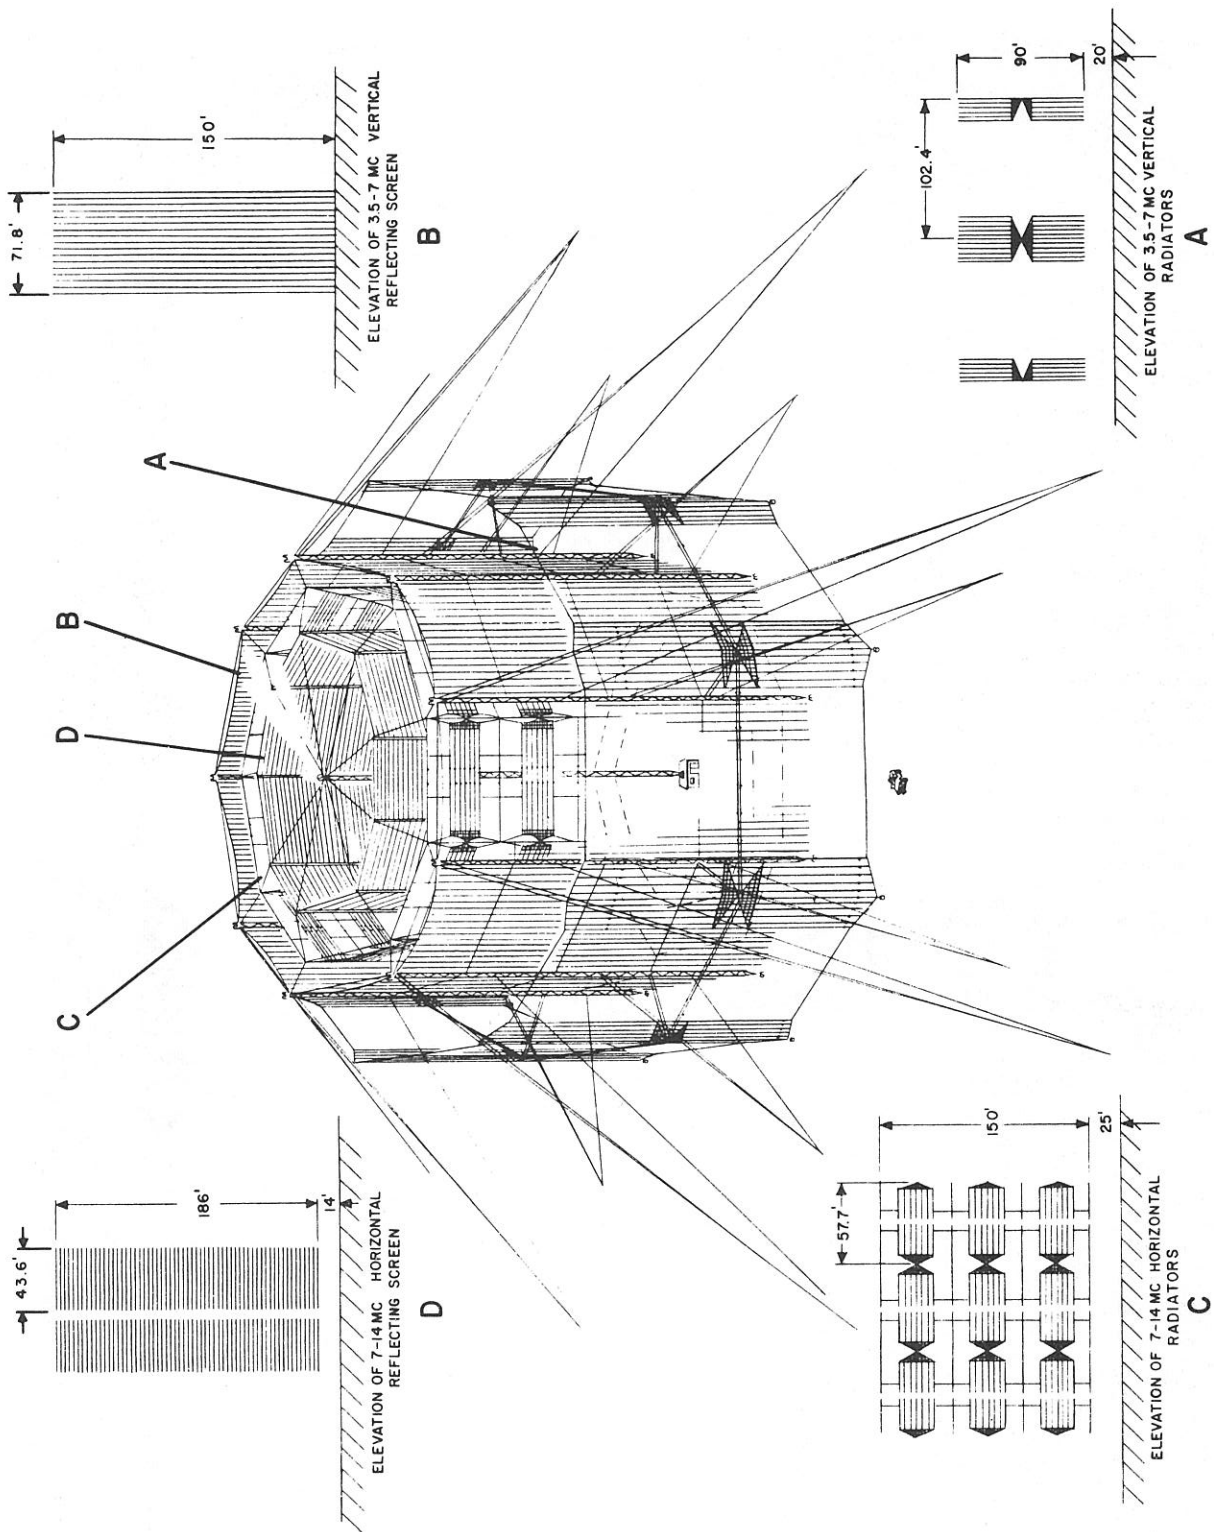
Typical Installation of a HF Steerable Beam Antenna System
